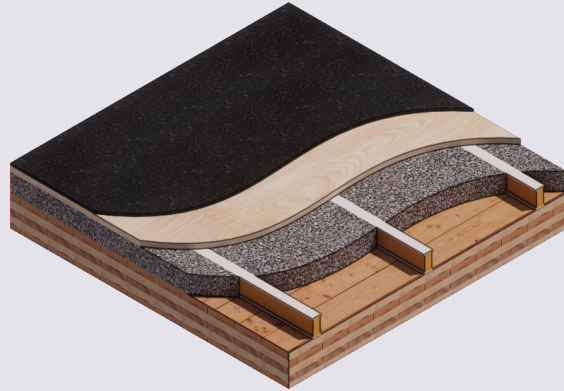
Hemp boards, gravel, and sleepers installed, Piano B 40/40 strips partially installed over sleepers
